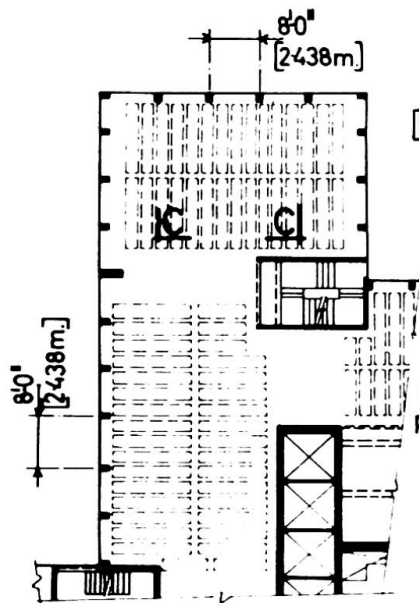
ALTERNATIVE FLOOR LAYOUT.
